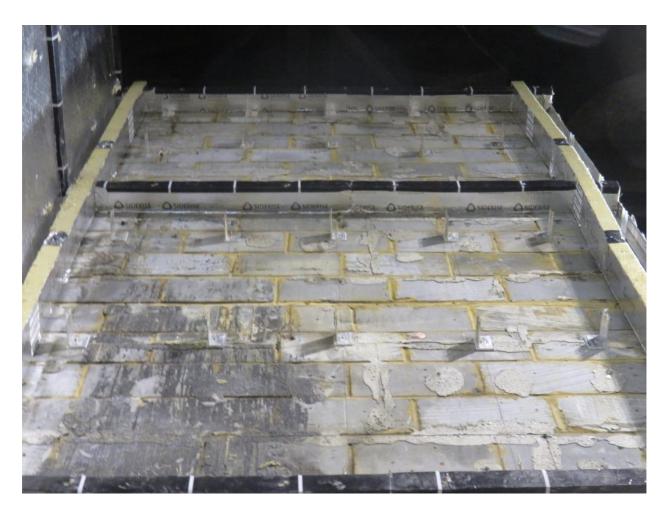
Horizontal intumescent cavity barriers fixed through the entire depth on face turned steel brackets, fitted between vertical cavity barriers.
